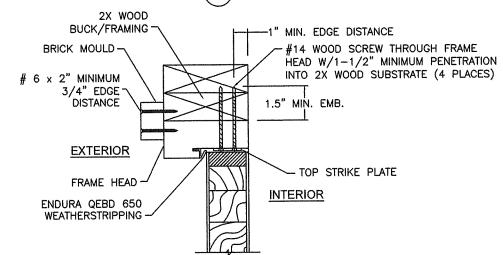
X WOOD BUCK/FRAMING INSTALLATION
